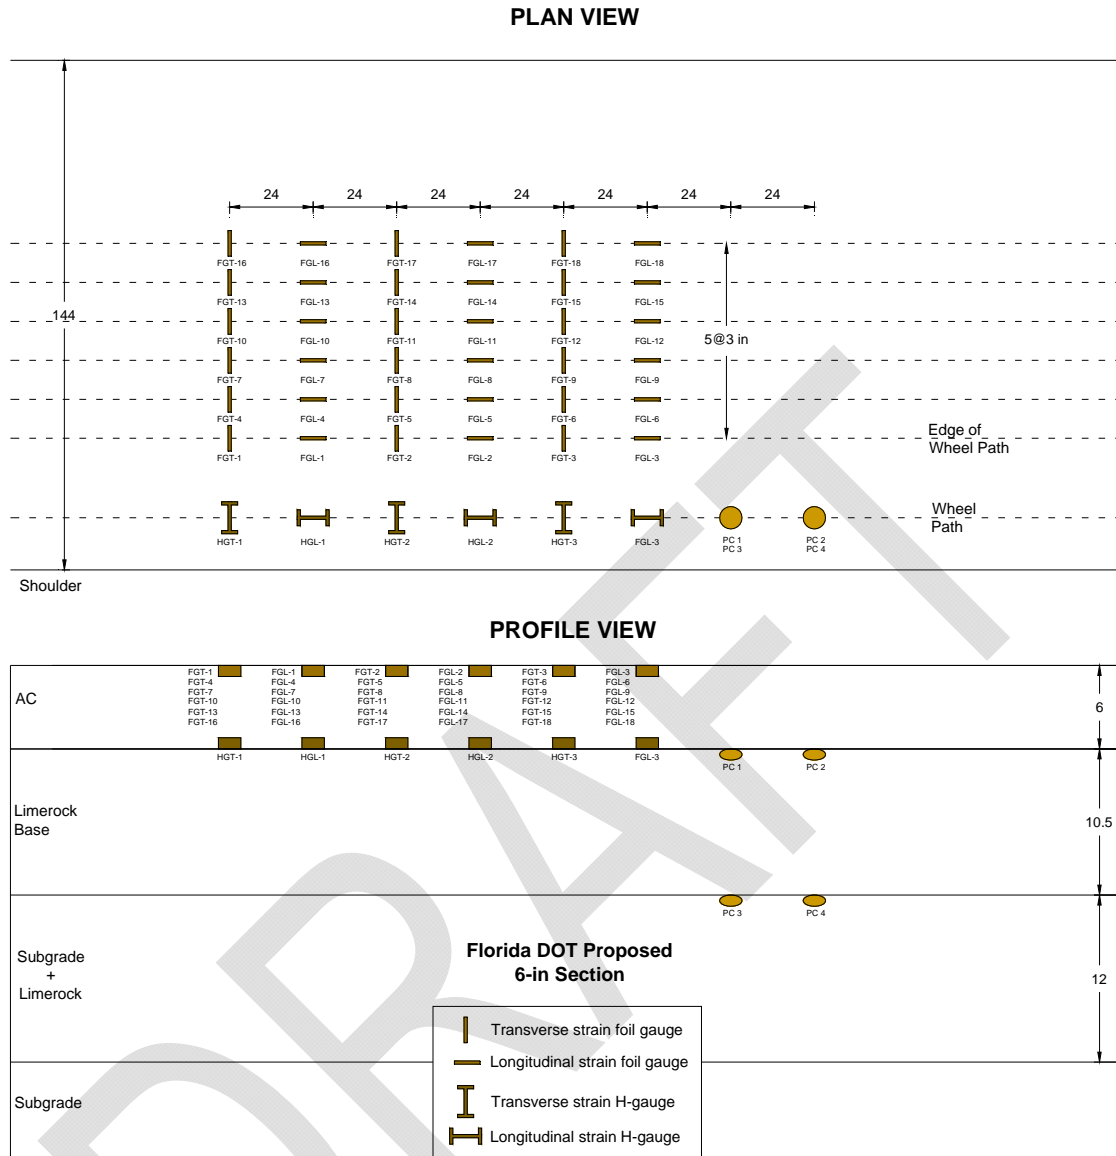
Plan and profile view of typical pavement structure and instrumentation of proposed section at Florida DOT
